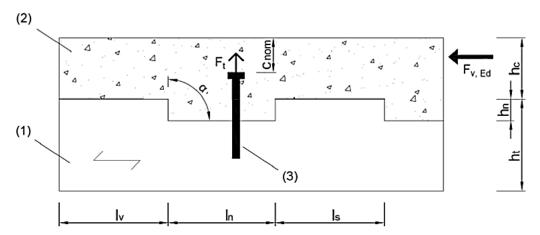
Dimensions of a notched connections [90]. (1) Timber, (2) Concrete, (3) Fastener.
